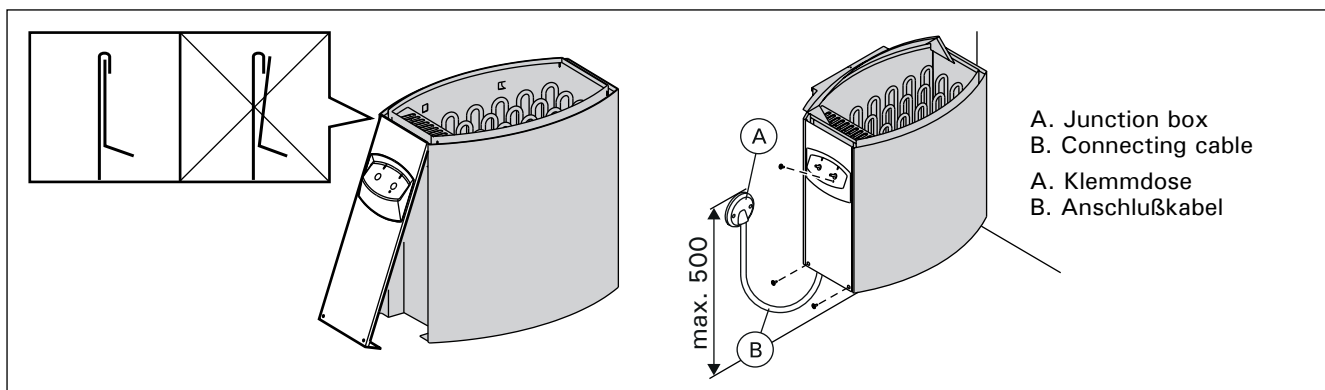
Closing the cover of the connection box (all dimensions in millimeters)
